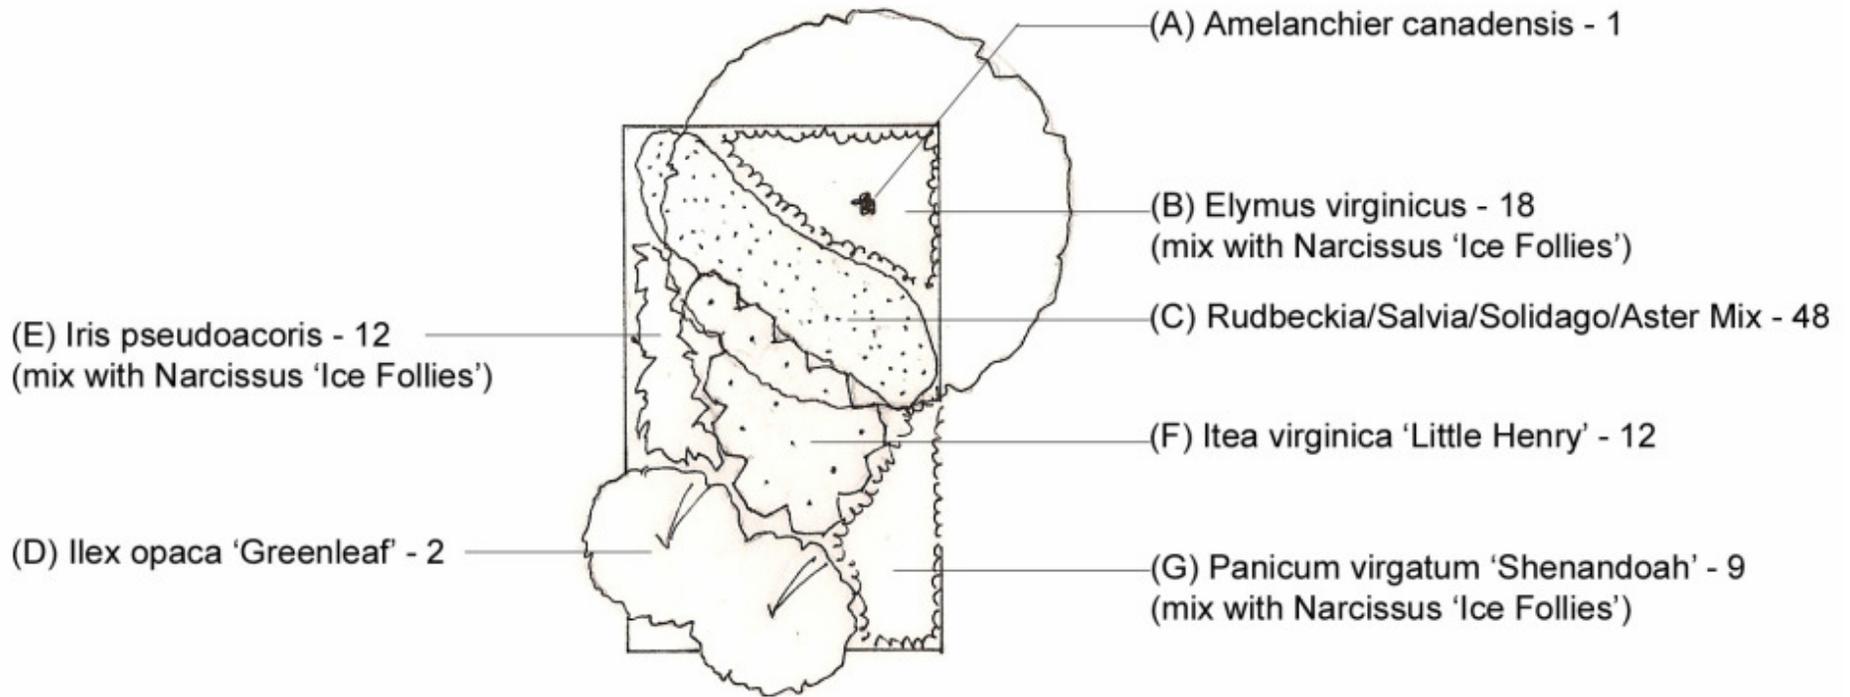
Planting list and layout for bioretention cell. Drawing not to scale.
